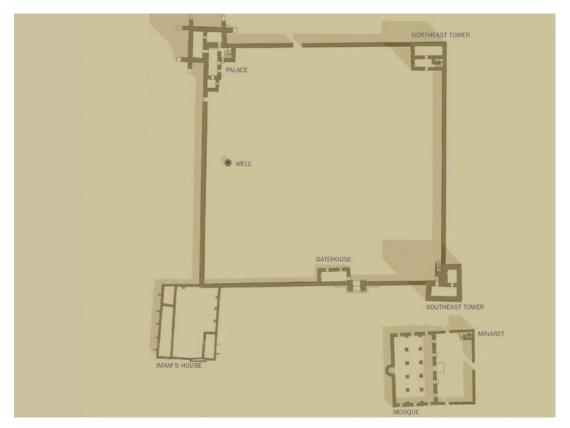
Site layout with the different components. Source: DCT Abu Dhabi.
